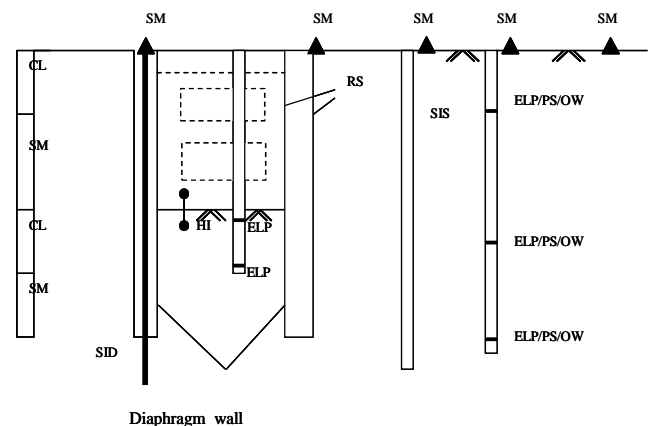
Typical cross section of geotechnical instruments used for underground works in Taiwan.
